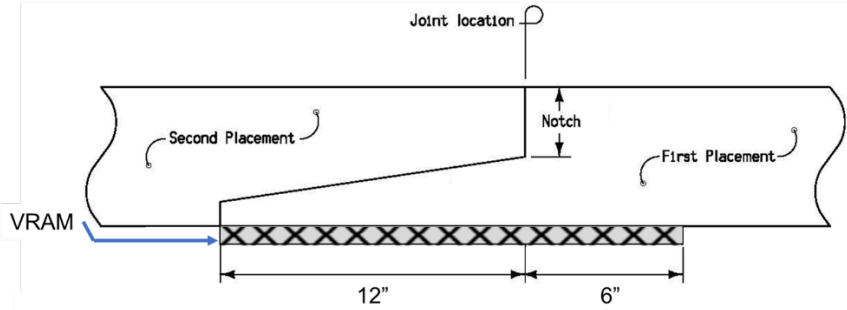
Example illustration of VRAM with a compacted notched-wedge joint. Drawing not to scale. Cross sections will vary. Refer to plans.
